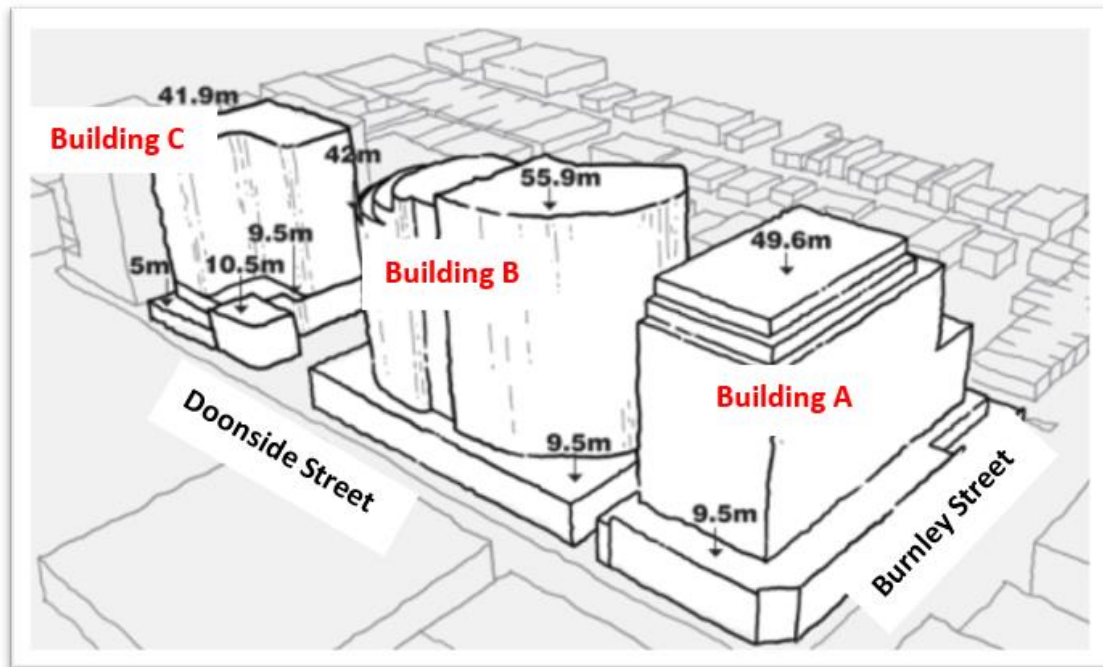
Proposed massing of buildings viewed from north-west. Source: Development Plan (Gurner 2023)
